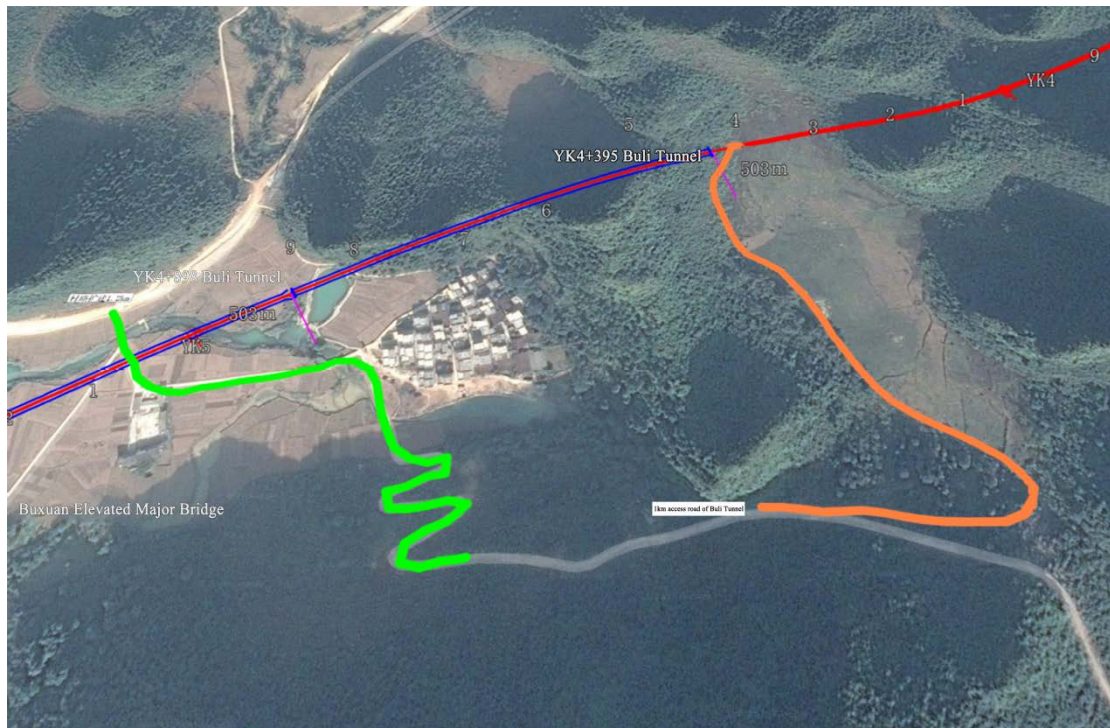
Location of New Access Road at Entrance of Buli Tunnel
